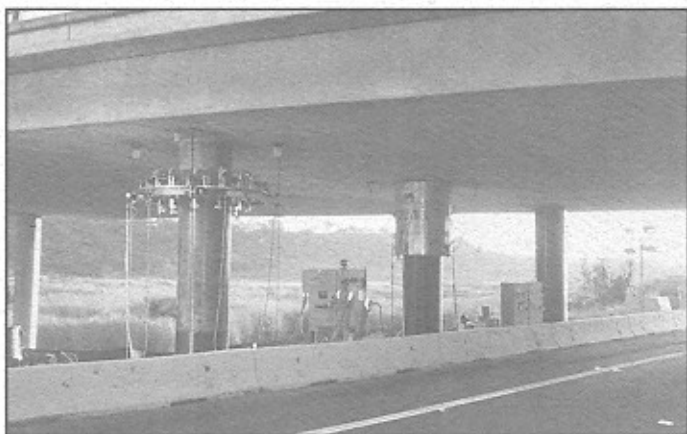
Repair of bridge columns using Robo-Wrapper™ technology.
